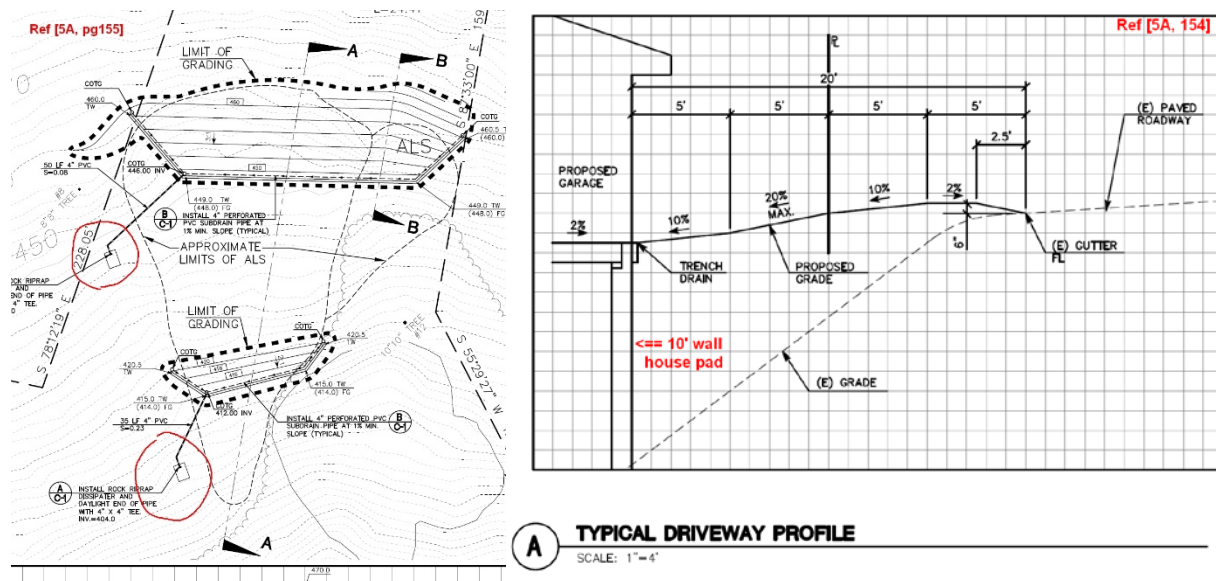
Pier stitched drainage areas, and 6b and house pad 10' walls typical
